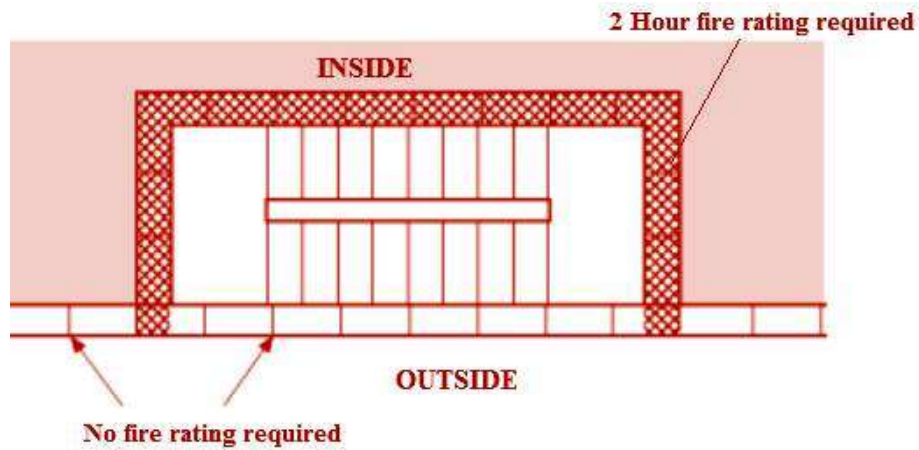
a.: Outside stair with exterior wall flushed with building wall
